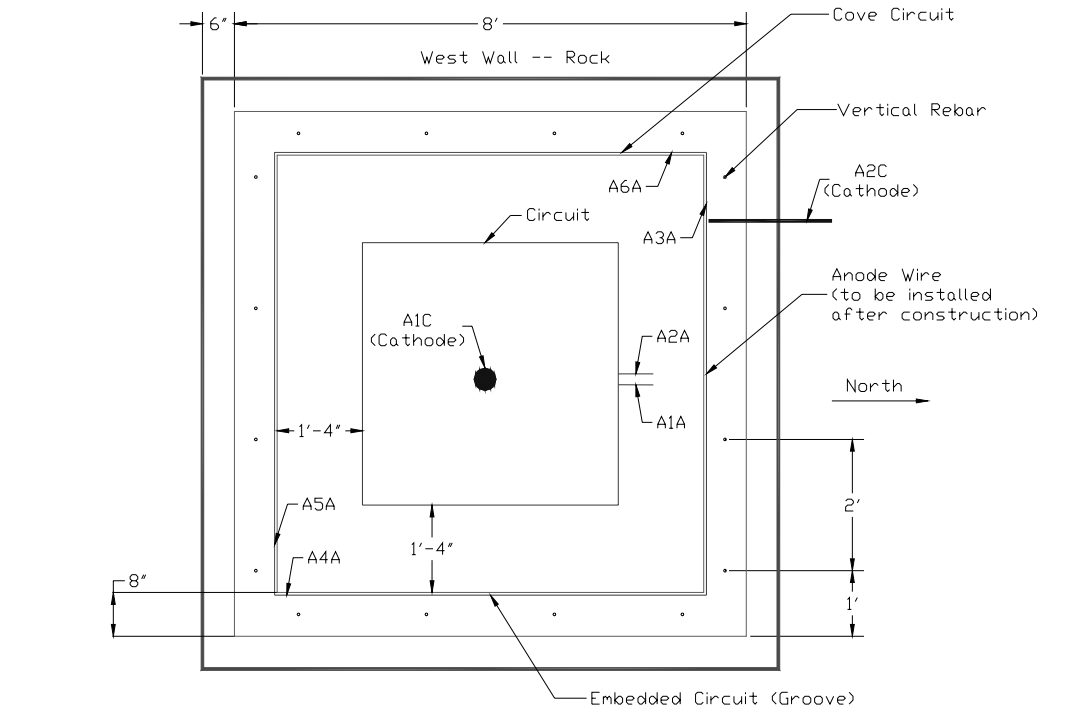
Floor Plan of Test Basement, showing anode circuit installed in the floor
